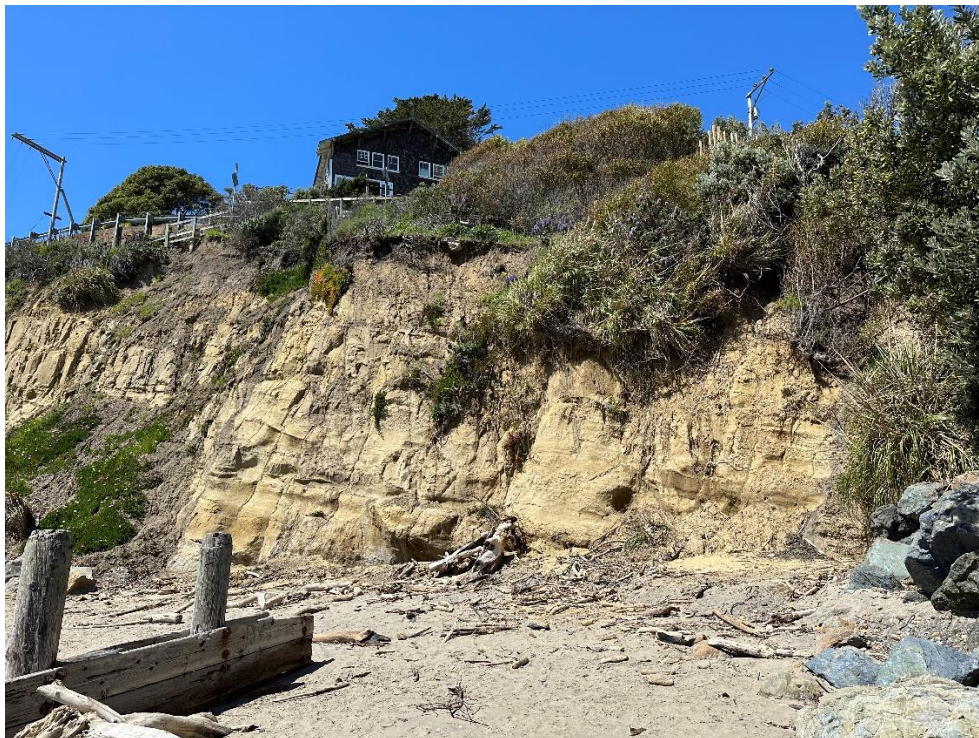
Unprotected bluff face adjacent to 100 Brighton Avenue. Photo: IMG_0382.jpg Date: 4/13/23
